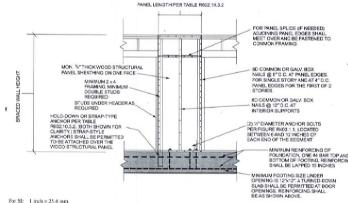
ALTERNATE BRACED WALL PANEL
